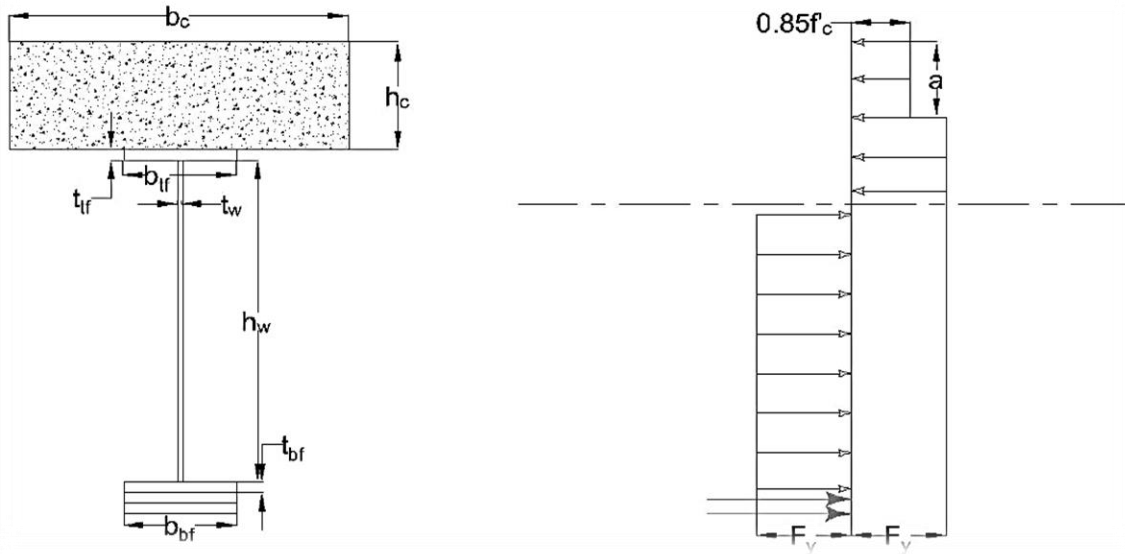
4 composite beam concrete and steel built up I section with double cover plate at bottom flange
